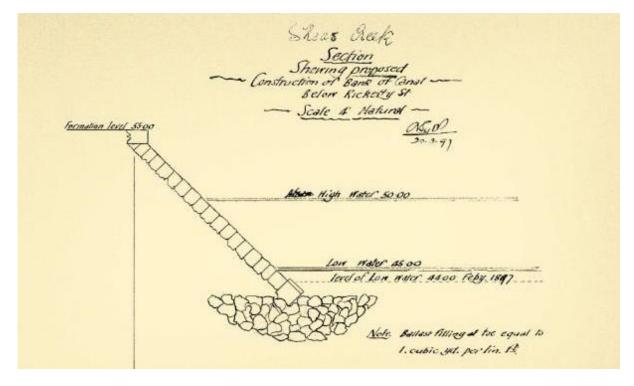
Alexandra Canal Wall cross section diagram illustrating the proposed construction of the canal's bank before Rickety Street and ballast filling at the base of the canal walls. Source. Sydney Water.
